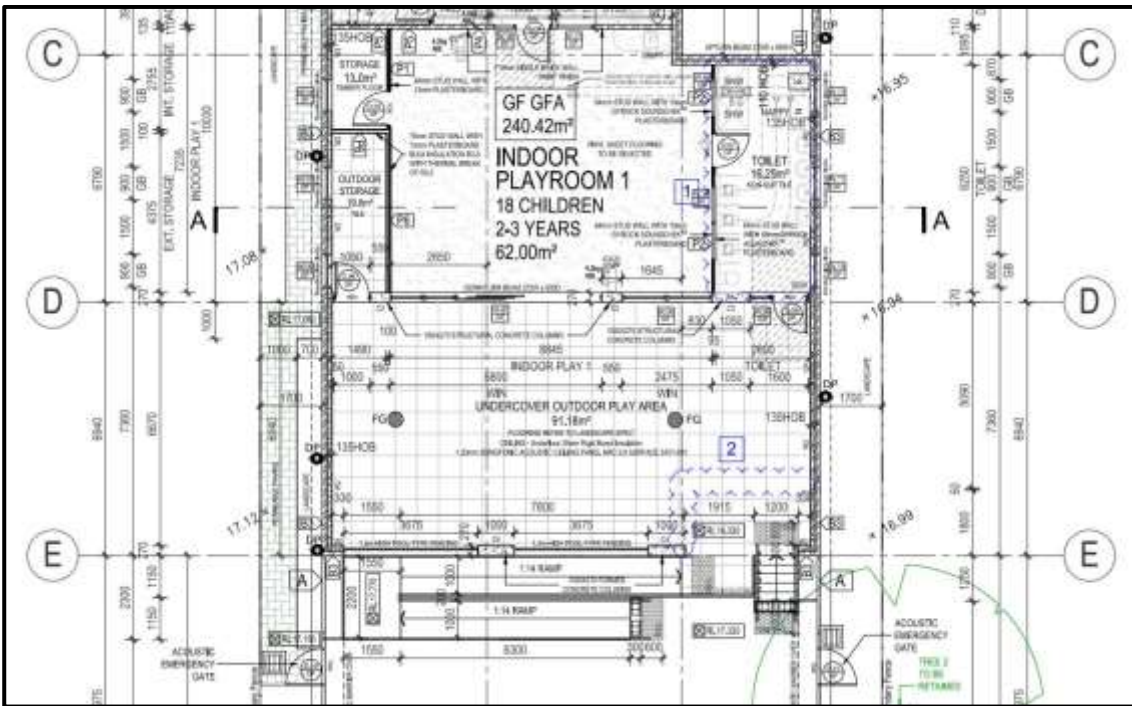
Proposed changes to ground floor – note changes to bathroom layout and removal of child resistant barrier on south-eastern corner of outdoor play area.
